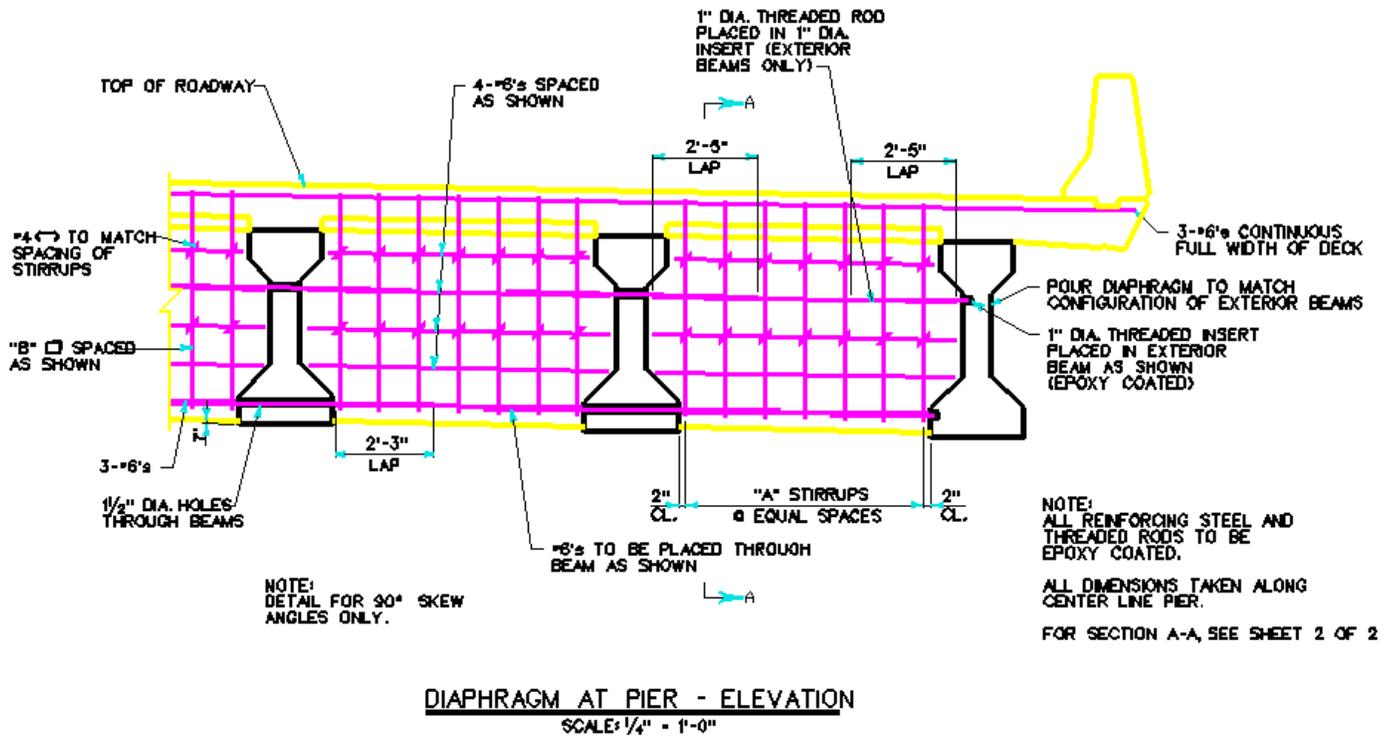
TRANSVERSE CROSS-SECTION OF DIAPHRAGM
